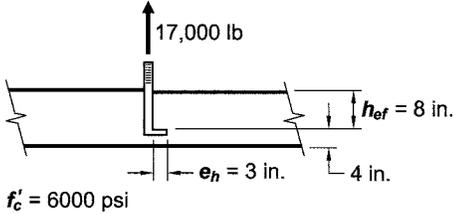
Example 2: Single hooked anchor in tension away from edges. (Note: Foundation reinforcement not shown for clarity.)
